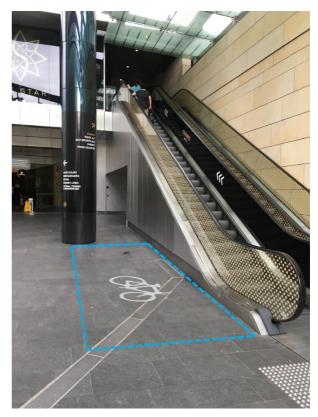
Proposed Location for visitor Bike Parking on Jones Bay Road
